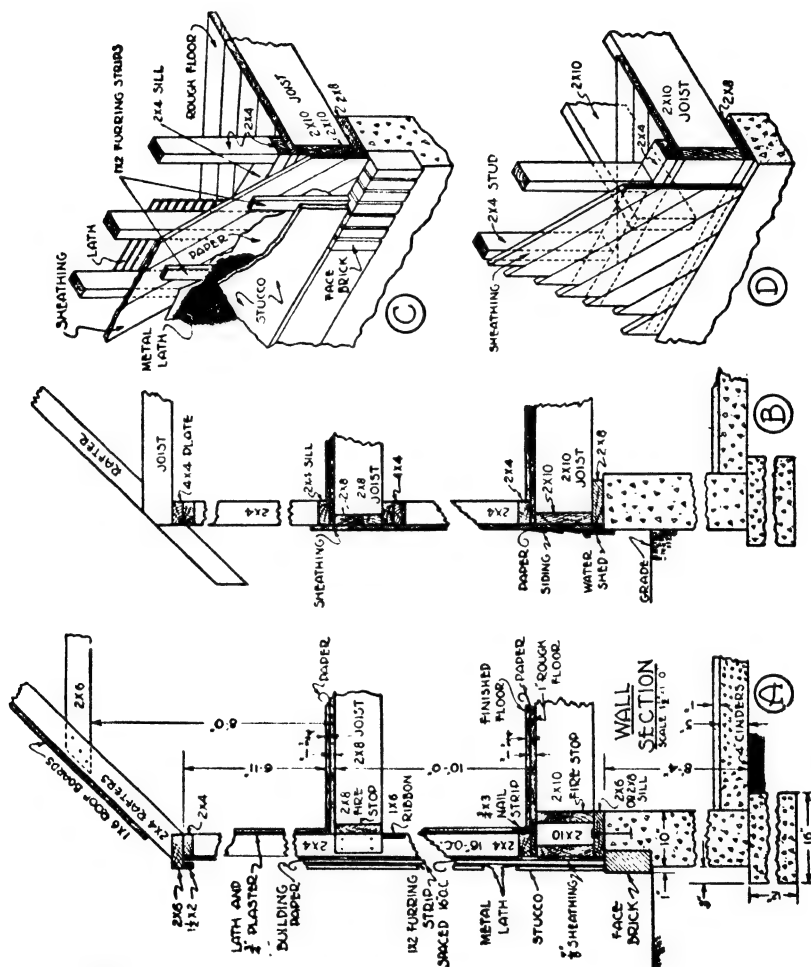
Wall Sections for Frame and Stucco A and Plan Frame B
